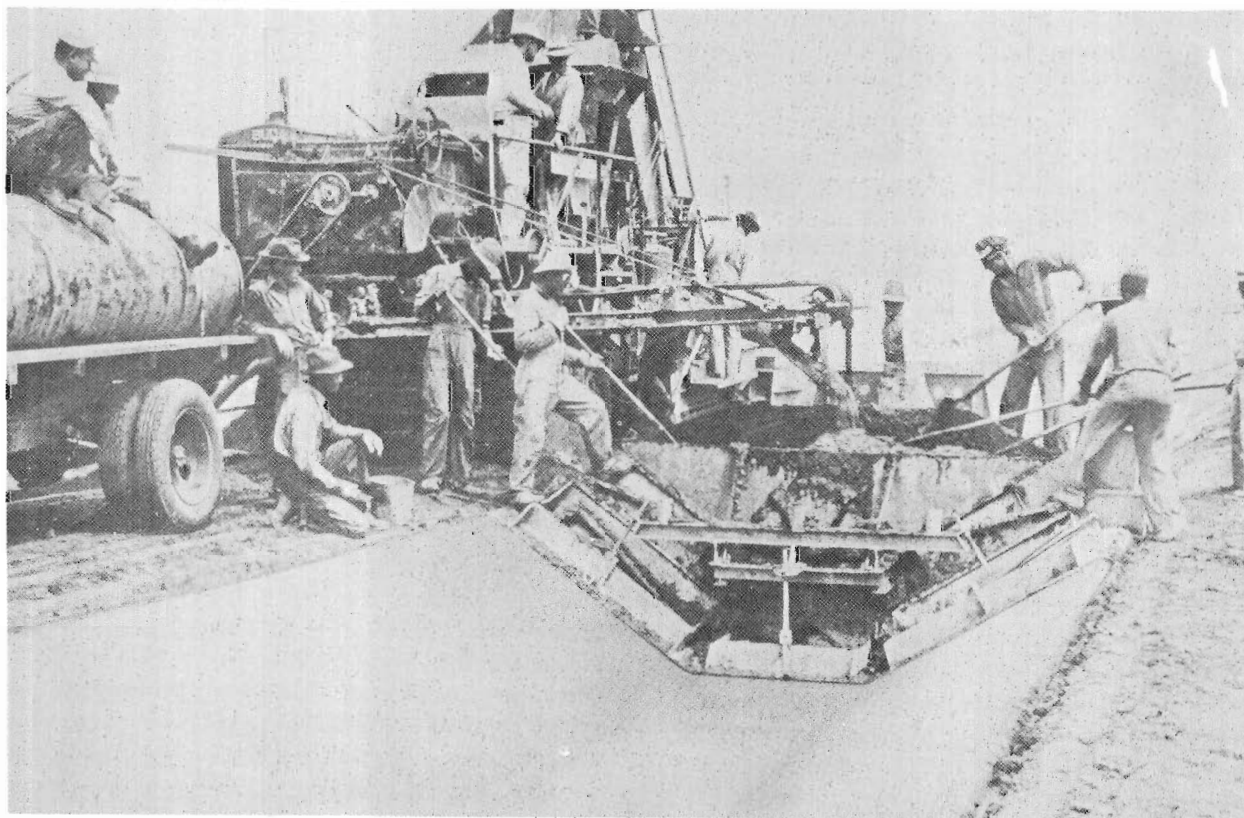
Traveling plant mixer and subgrade-guided slip-form used in placing plastic soil-cement lining in West 11.5 Lateral of the W. C. Austin project, Oklahoma. PX-D-1026.
